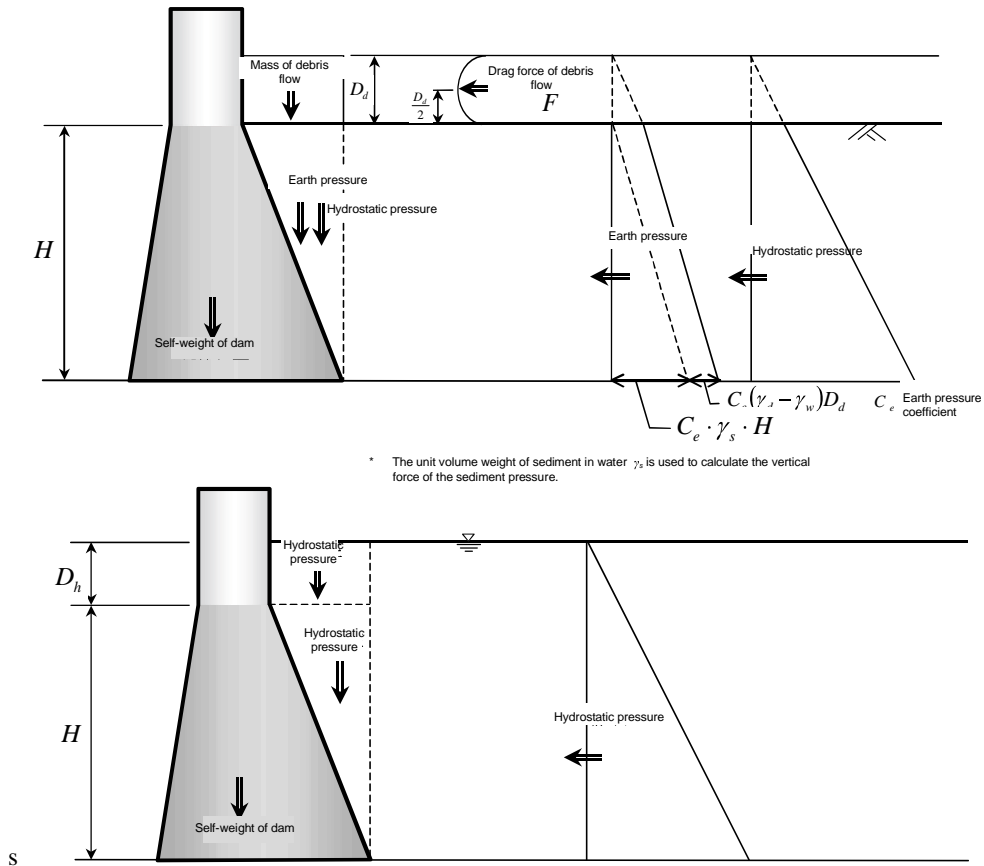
Closed Type Sabo dam: Design external forces of the Non-overflow section (H < 15 m, Top: during debris flow, bottom: during flooding)
